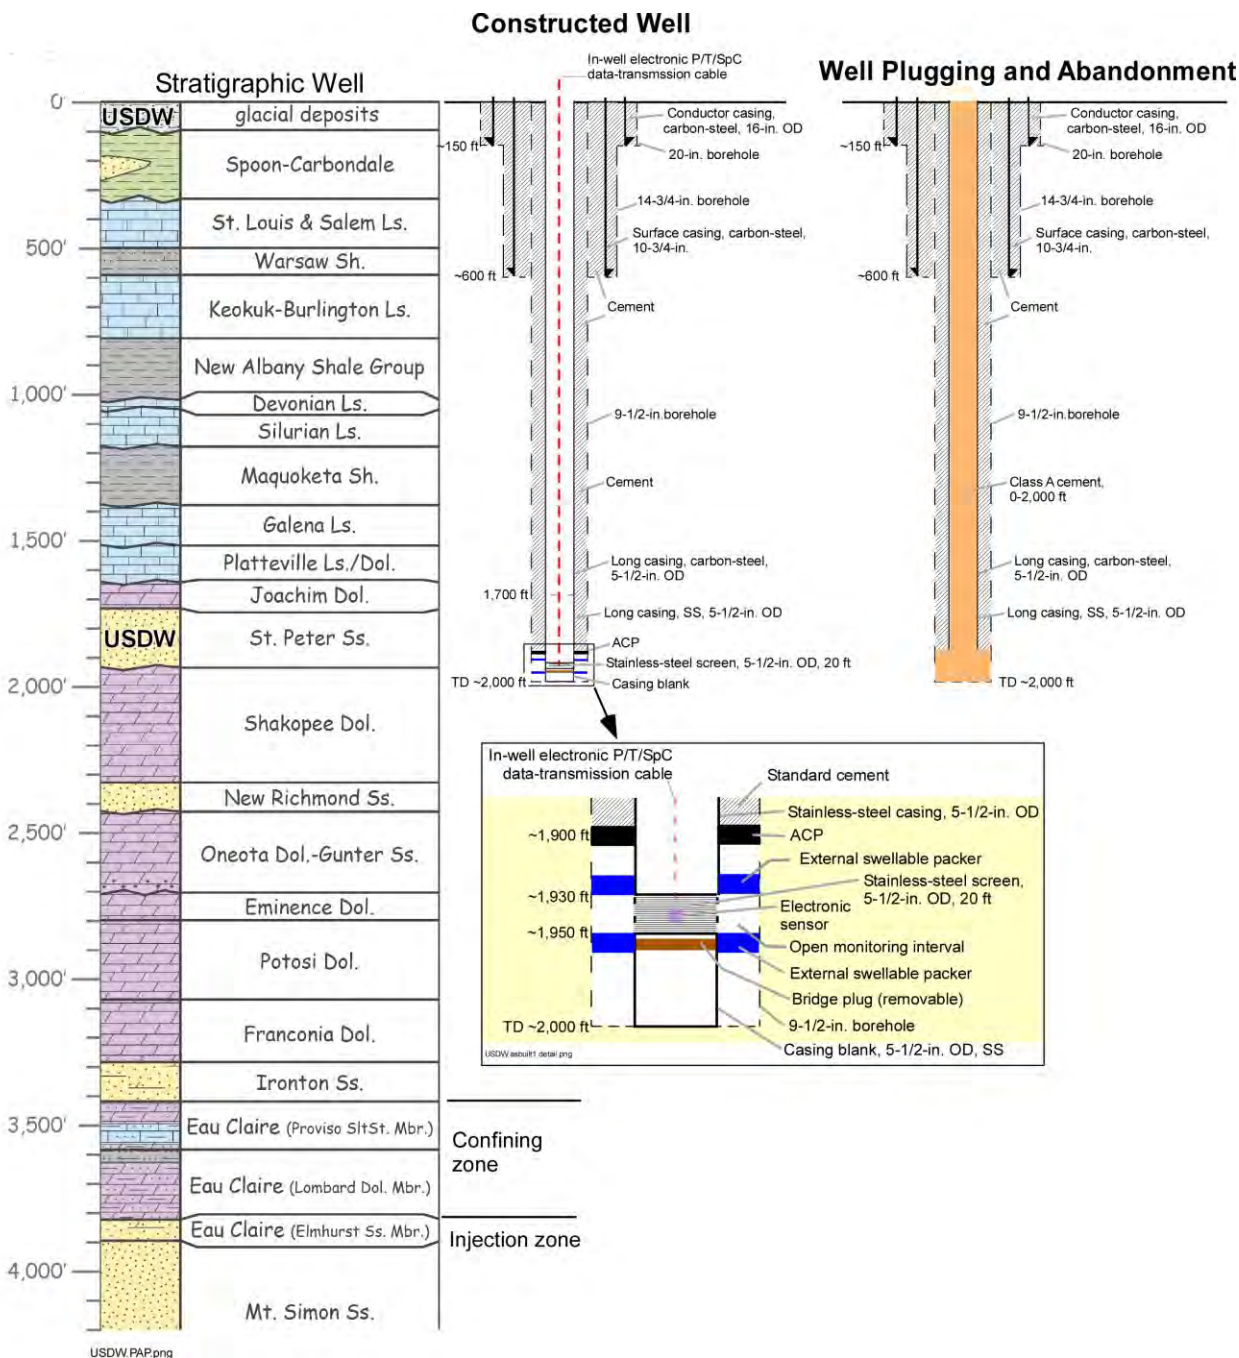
Construction design and plugging and abandonment plan for the USDW monitoring well.
